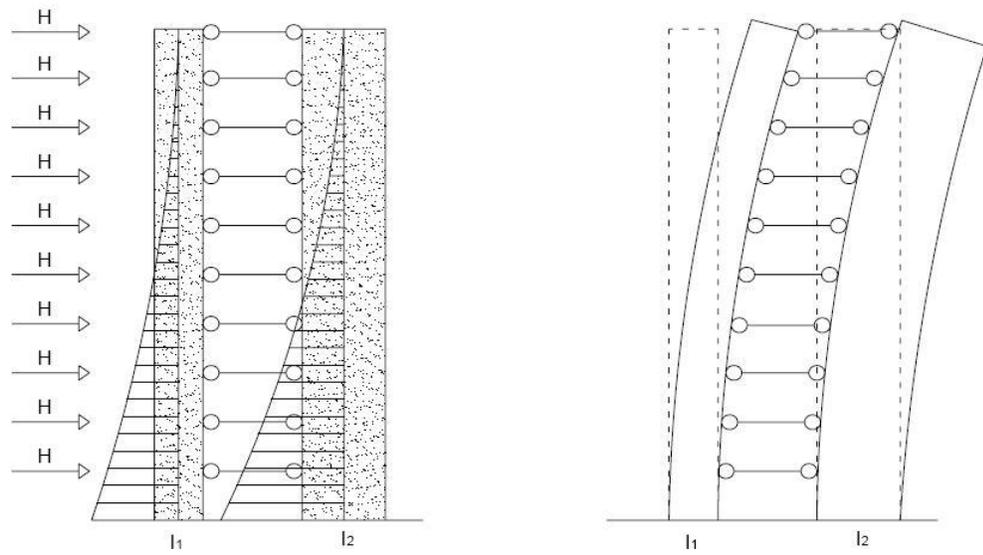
The reaction of a system of walls against horizontal loads, moment's diagram (left), and displacement of floors (right).
